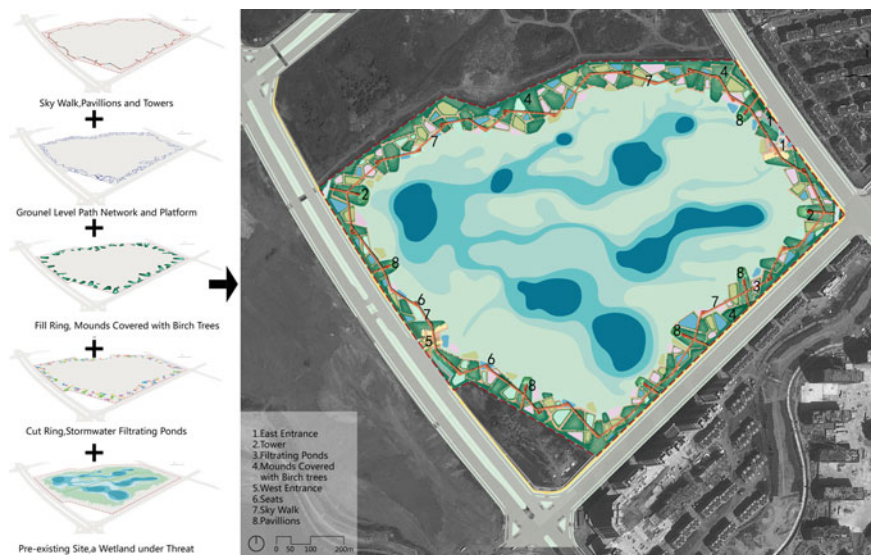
Qunli Storm-water Park: the design concept and site plan (Source Turenscape)
